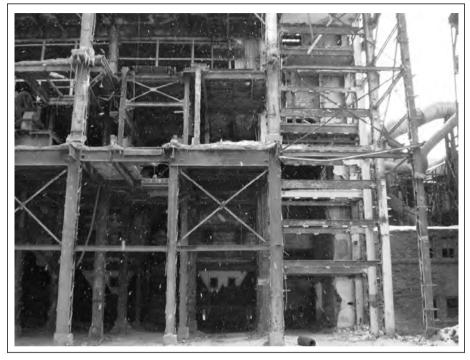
Construction site for the Lead ISASMELTTM Plant at UKMC
